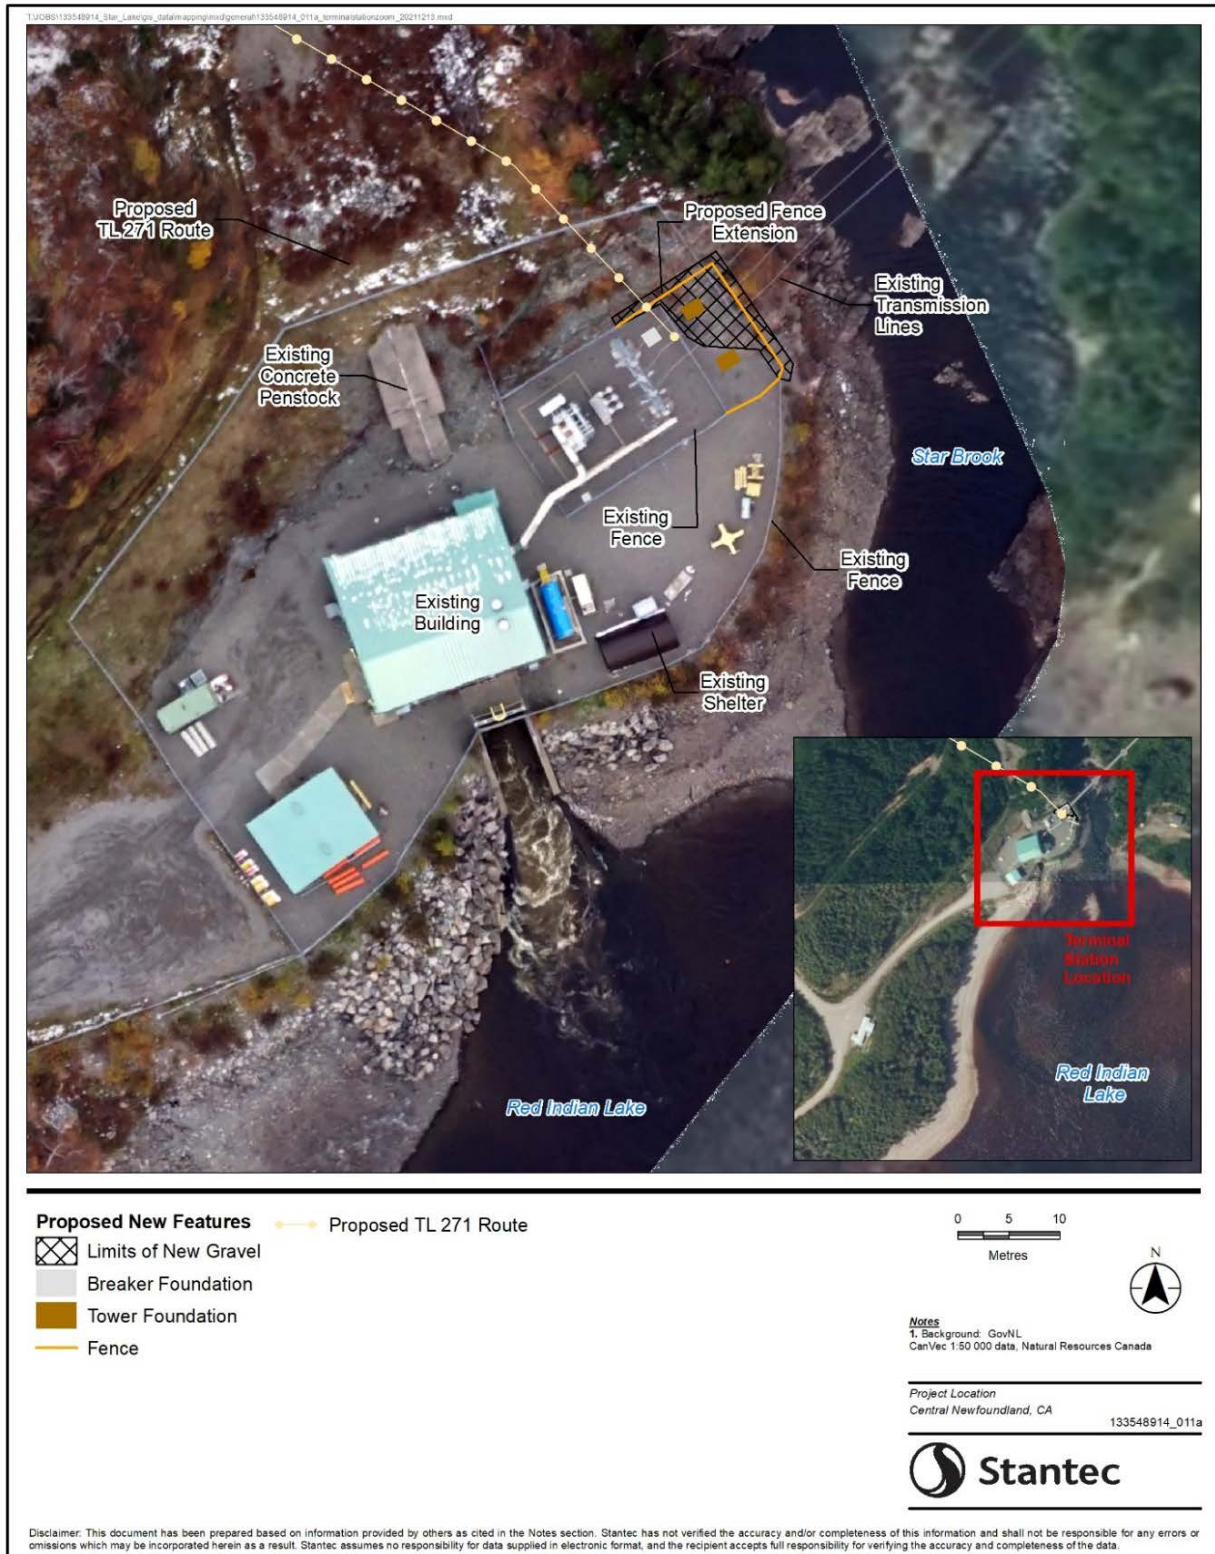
Star Lake Terminal Station Site Plan with Proposed Modifications
